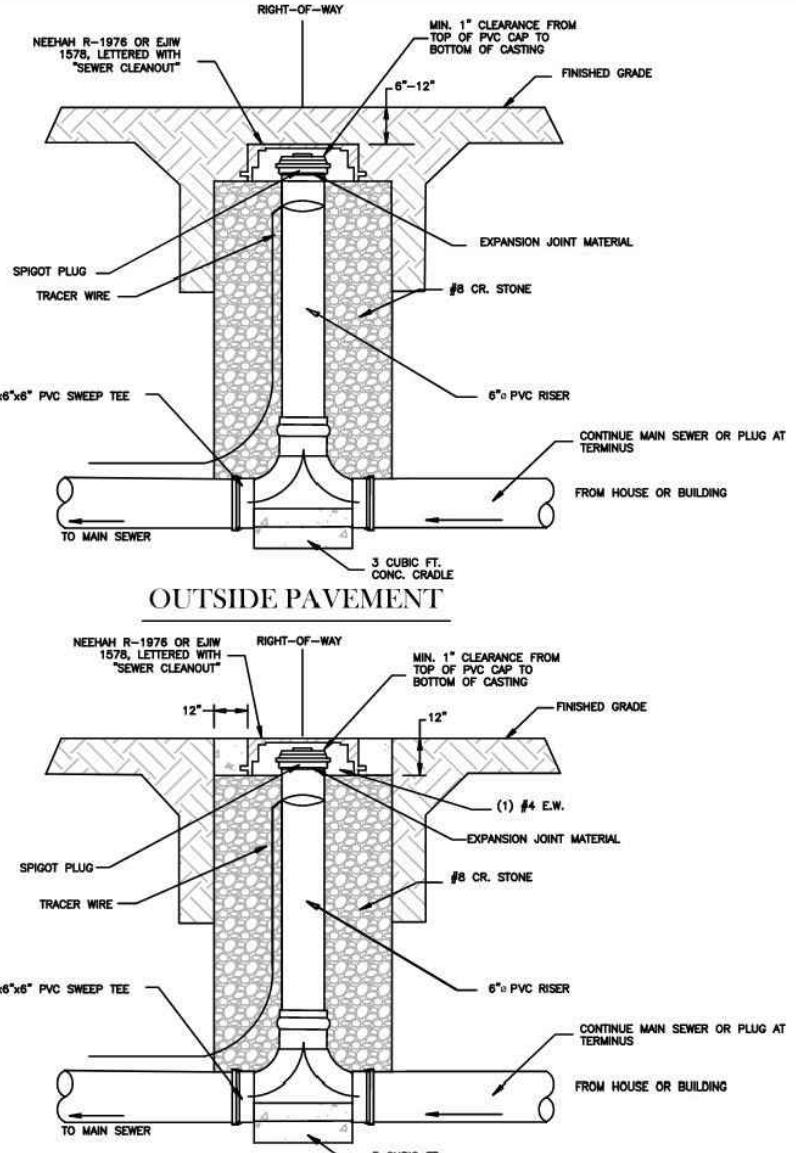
HOUSE/BUILDING SERVICE
